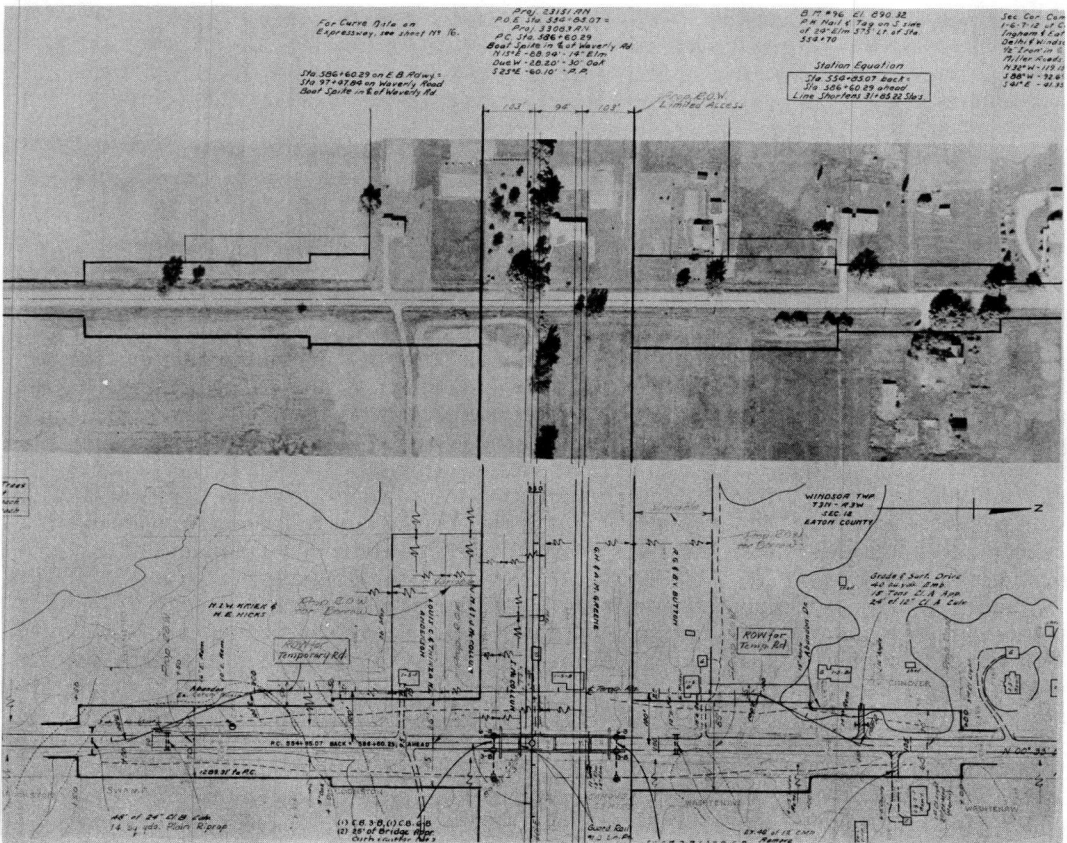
Matching of aerial photograph of rural road crossing over Interstate 96 near Lansing with planimetric map of same area.
